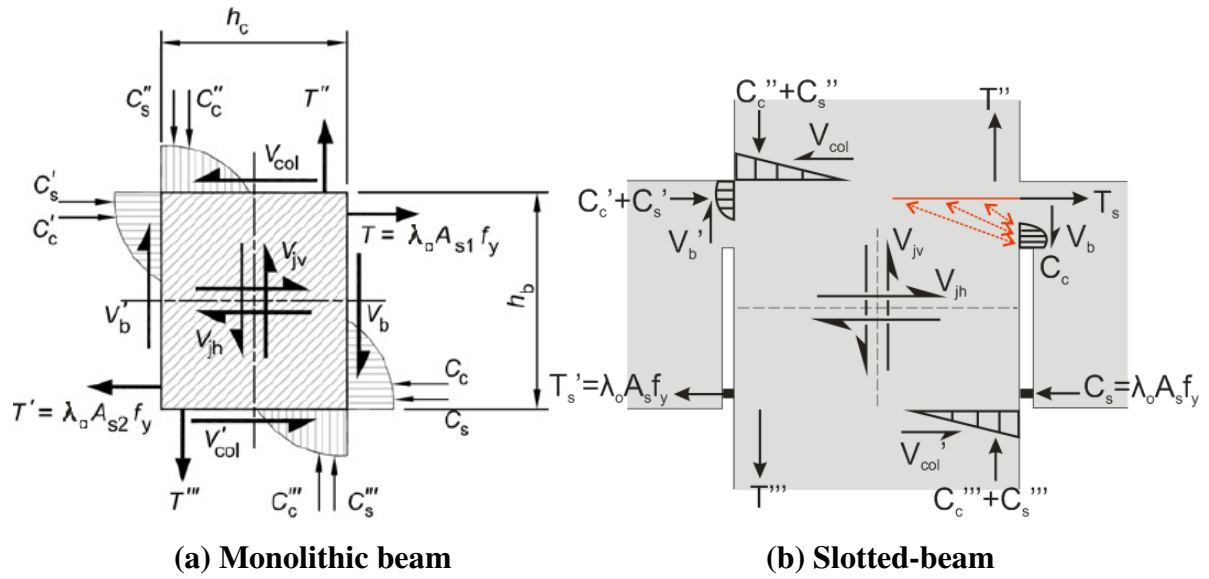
External actions on interior beam-column joints with conventional monolithic beams and slotted-beams
